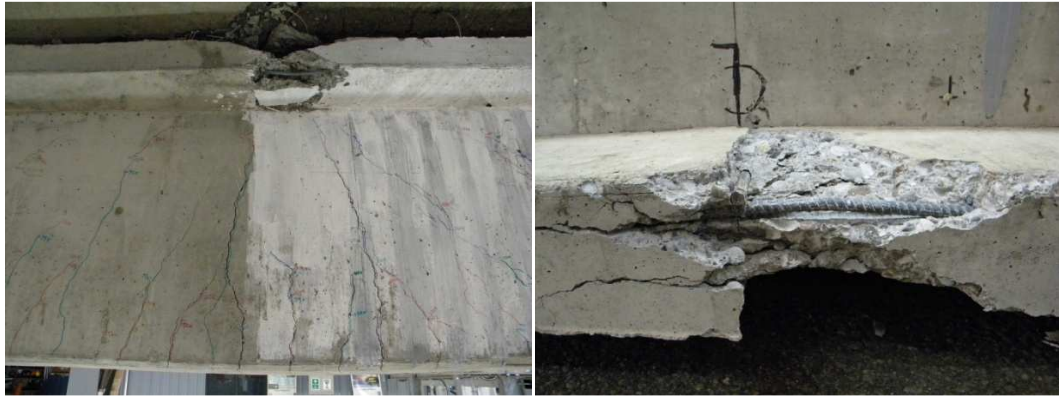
Specimen T.6.18.6.S and T.6.18.12.S failure
